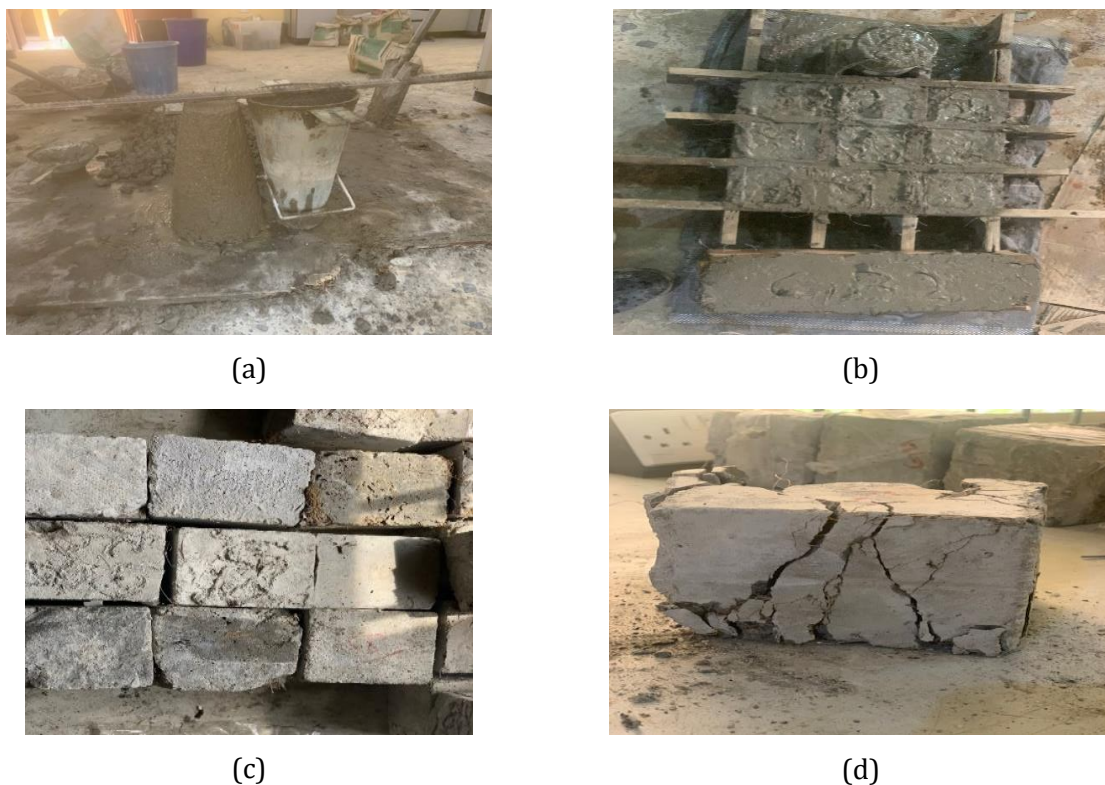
(a) Slump measurement (b) Concrete cubes, cylinder, and beams casting (c) Concrete cube after curing (d) Failed concrete
